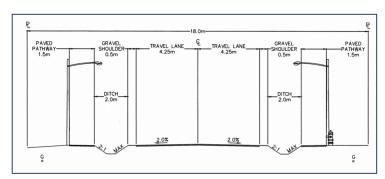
Rural Minor Collector Road - 18.0 m ROW Standard
